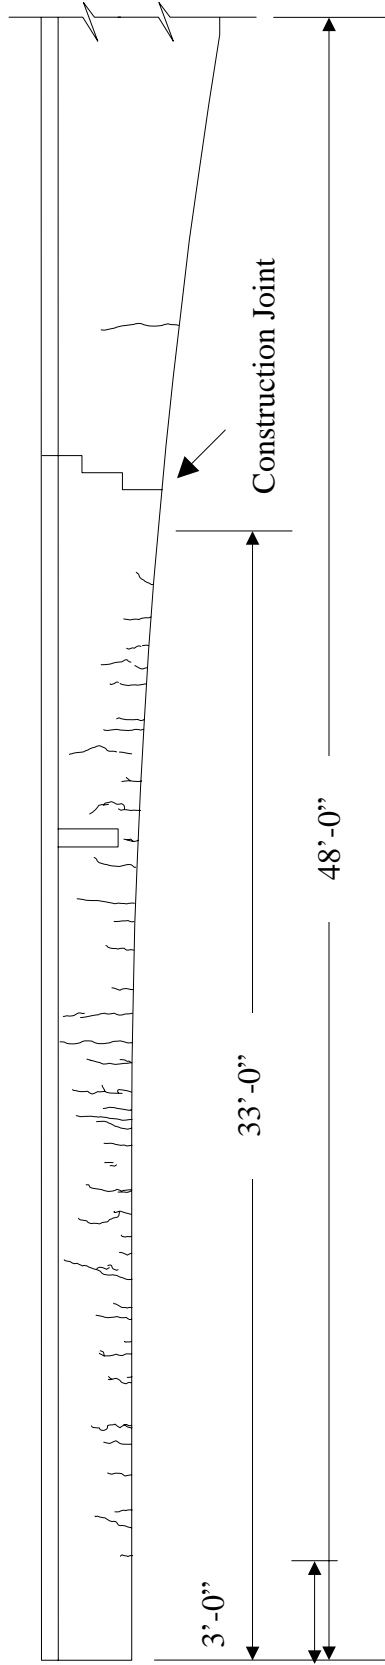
Crack Pattern for Typical End Girder
